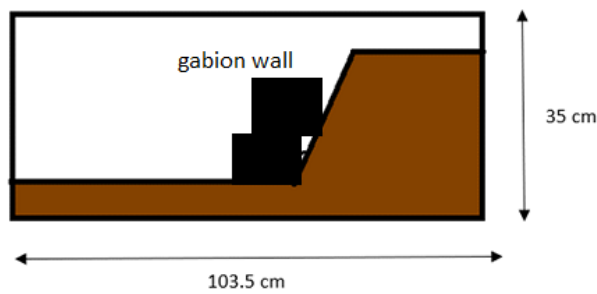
Cross section of soil slope with countermeasure against failure (gabion type retaining wall).
